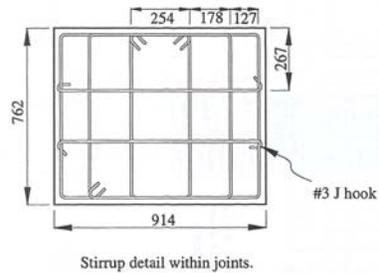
Joint Section for Knee-Sri-RND-1 & Tee-Sri-RND-2 (units in mm)
